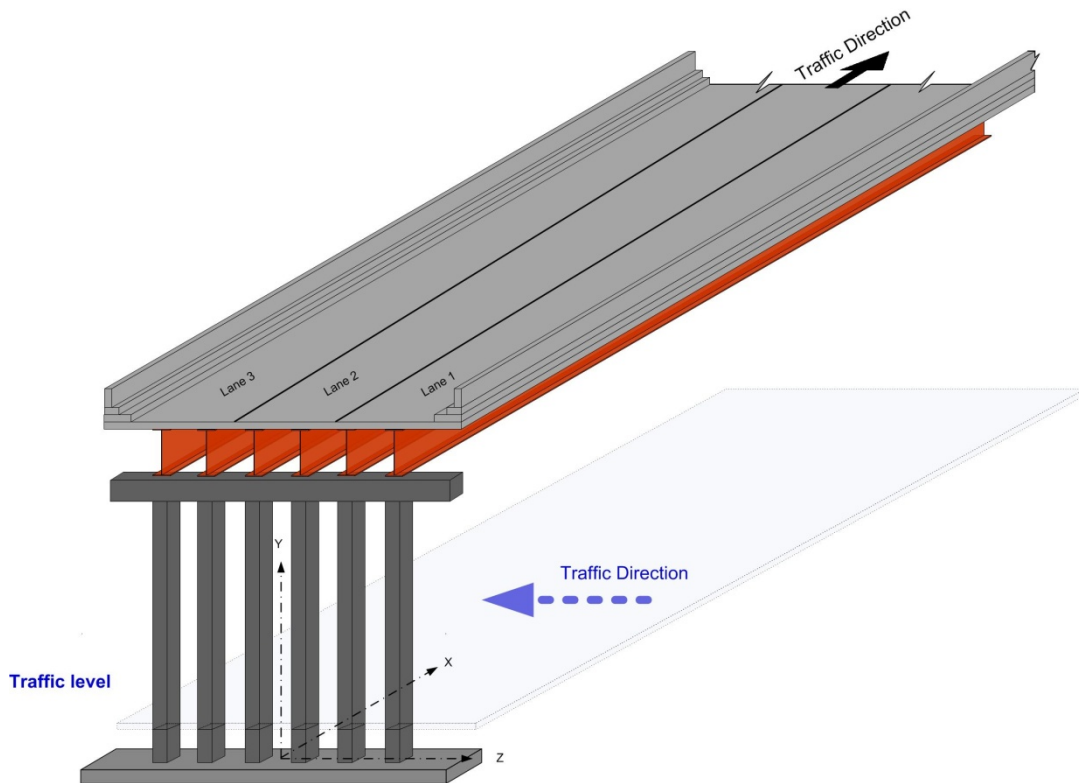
a: Case study V: bridge columns of slab-on-girder bridge subjected to local corrosion.
